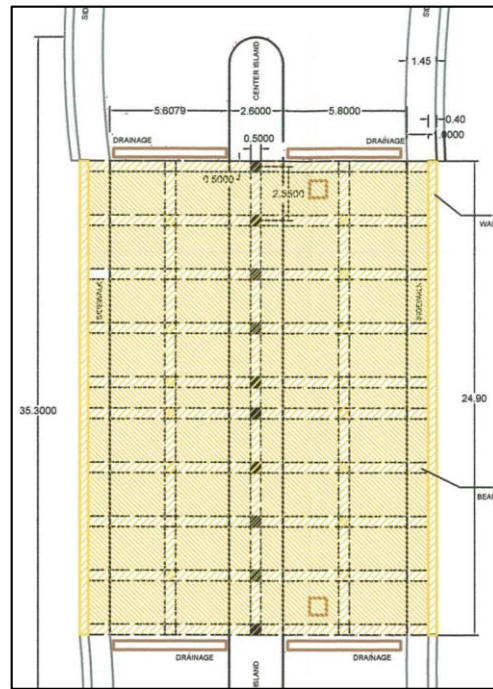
Layout of elements that have to be repaired (drainage system)
